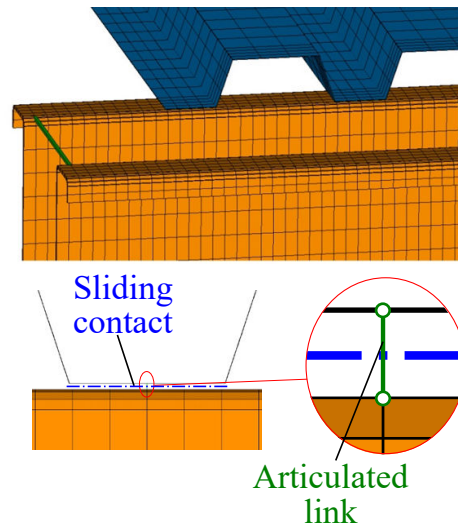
Model of the connection between the steel deck and a top flange of the steel section
